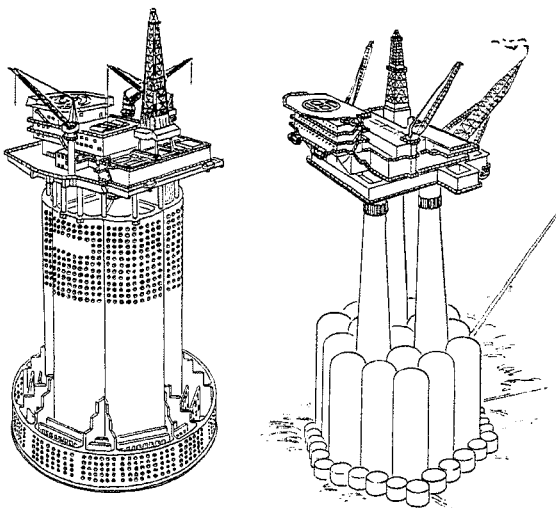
Condeep and Doris type concrete gravity platforms (from FIP, 1978).
